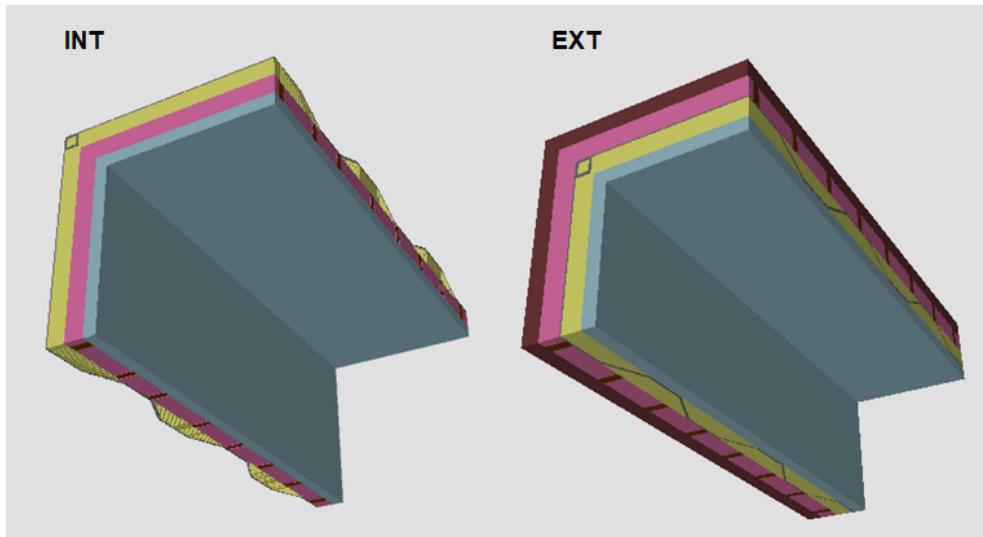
3D AnTherm wall-roof corner construction views according to Table 10
